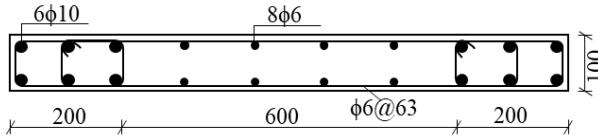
Top view dimensions and reinforcement details of SW-1
